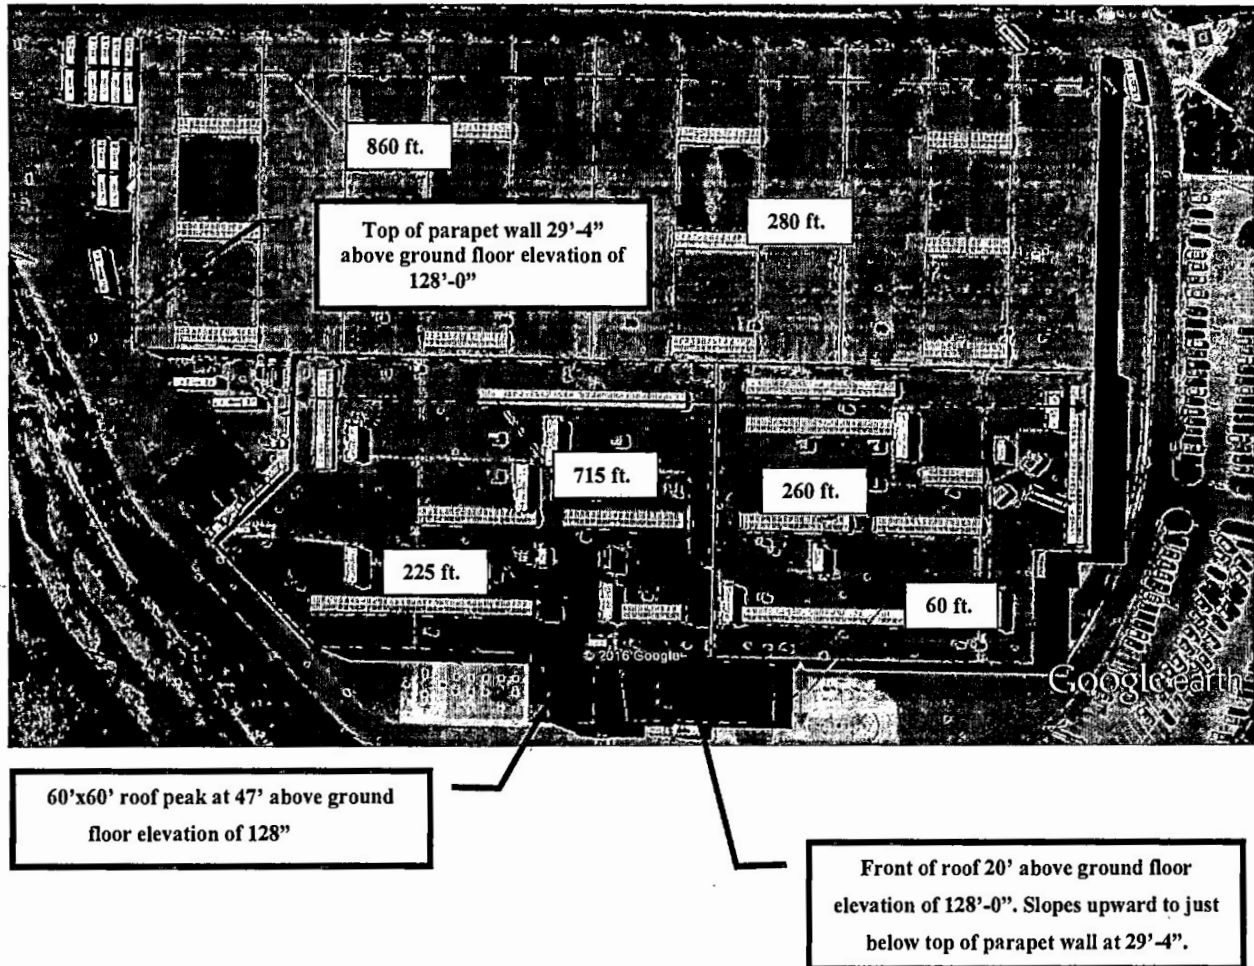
Midvale Garage Dimensions & Roof Elevations
